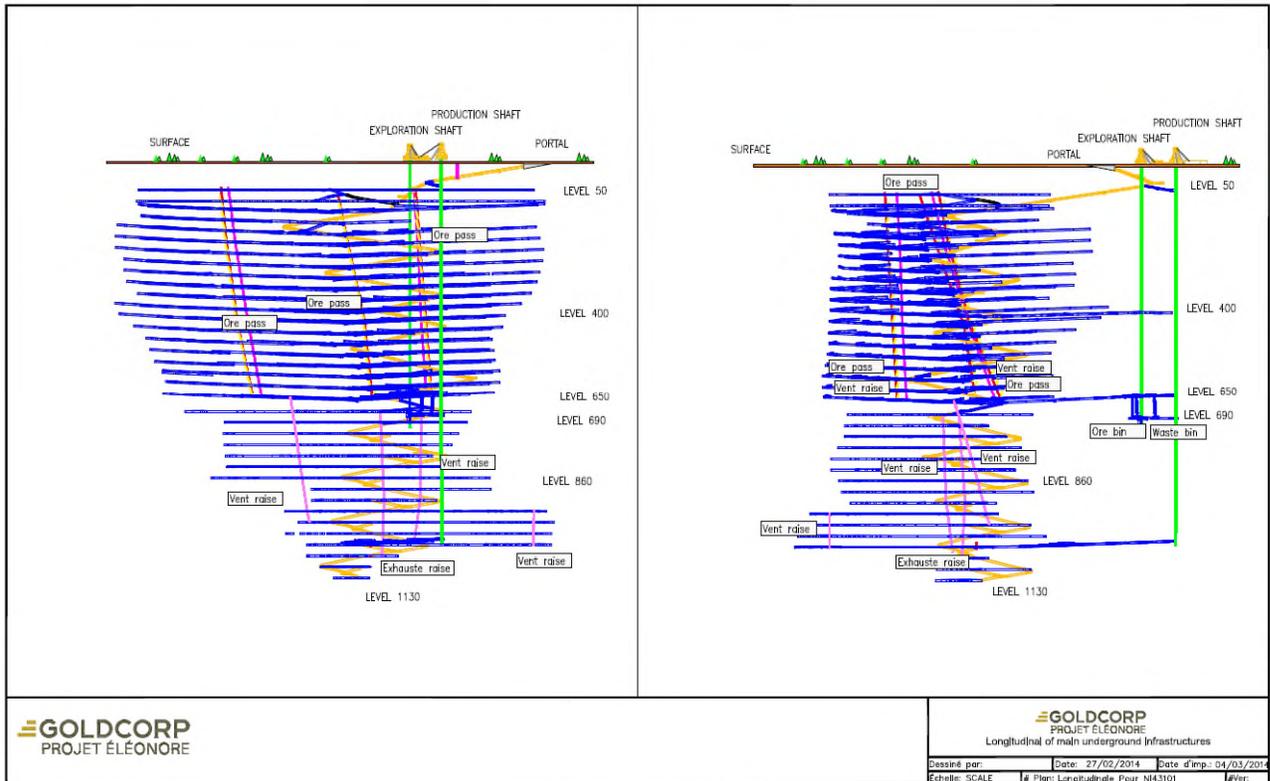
Longitudinal section showing the location of the main underground infrastructure
